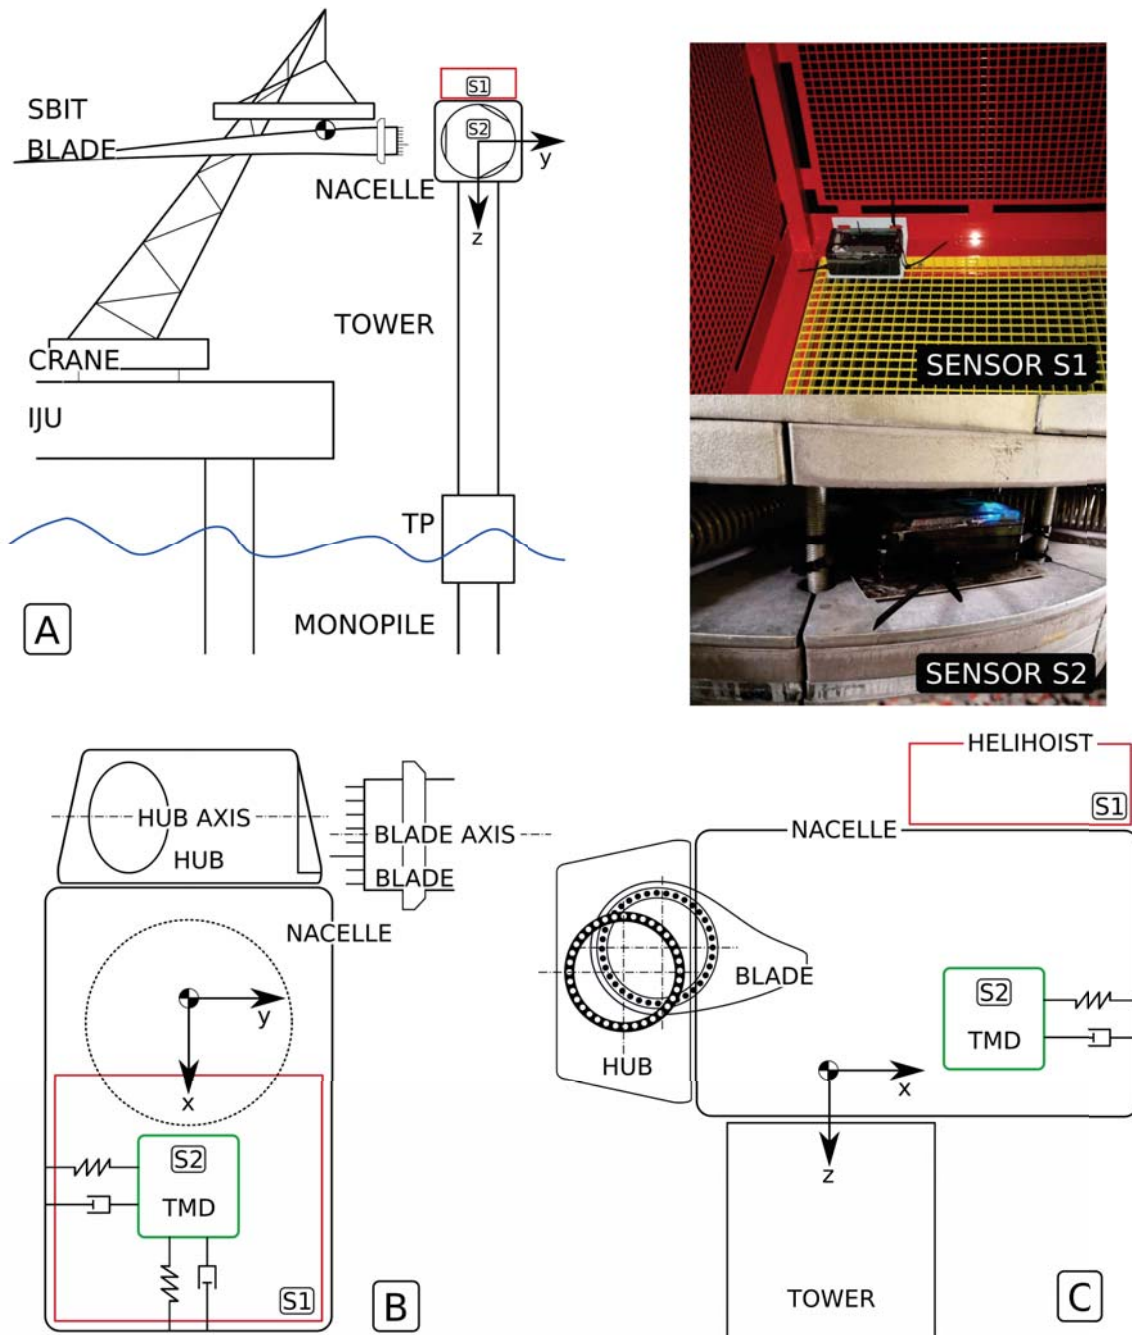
Typical setup of a single blade installation. (A) Installation Jack Up Unit (IJU) next to the Tower-Nacelle-Hub Assembly with the blade being attached to a Single Blade Installation Tool (SBIT), typically a yoke-like structure. The red square indicated the helicopter hoisting platform. S1 and S2 correspond to the sensors used within this study to determine dynamic behaviour of the turbine. (B) Top view of the single blade installation process. The green structure represents the tuned mass damper, deployed during single blade installation. (C) Side view of the installation process. Upper right figures: Sensors S1 and S2 mounted on the helicopter hoisting platform and the tuned mass damper respectively.
